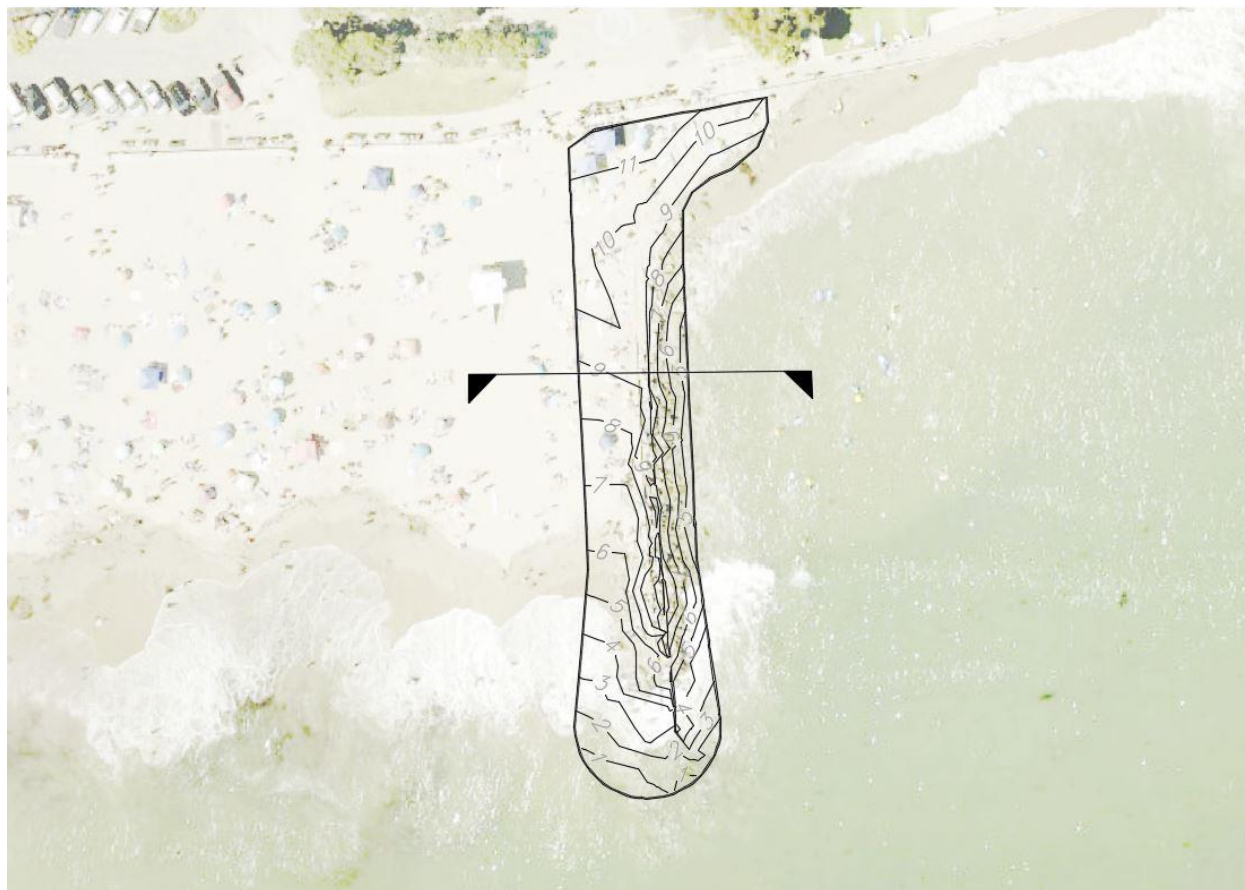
Existing Elevations (feet MLLW) from topographic Survey in May 2018
